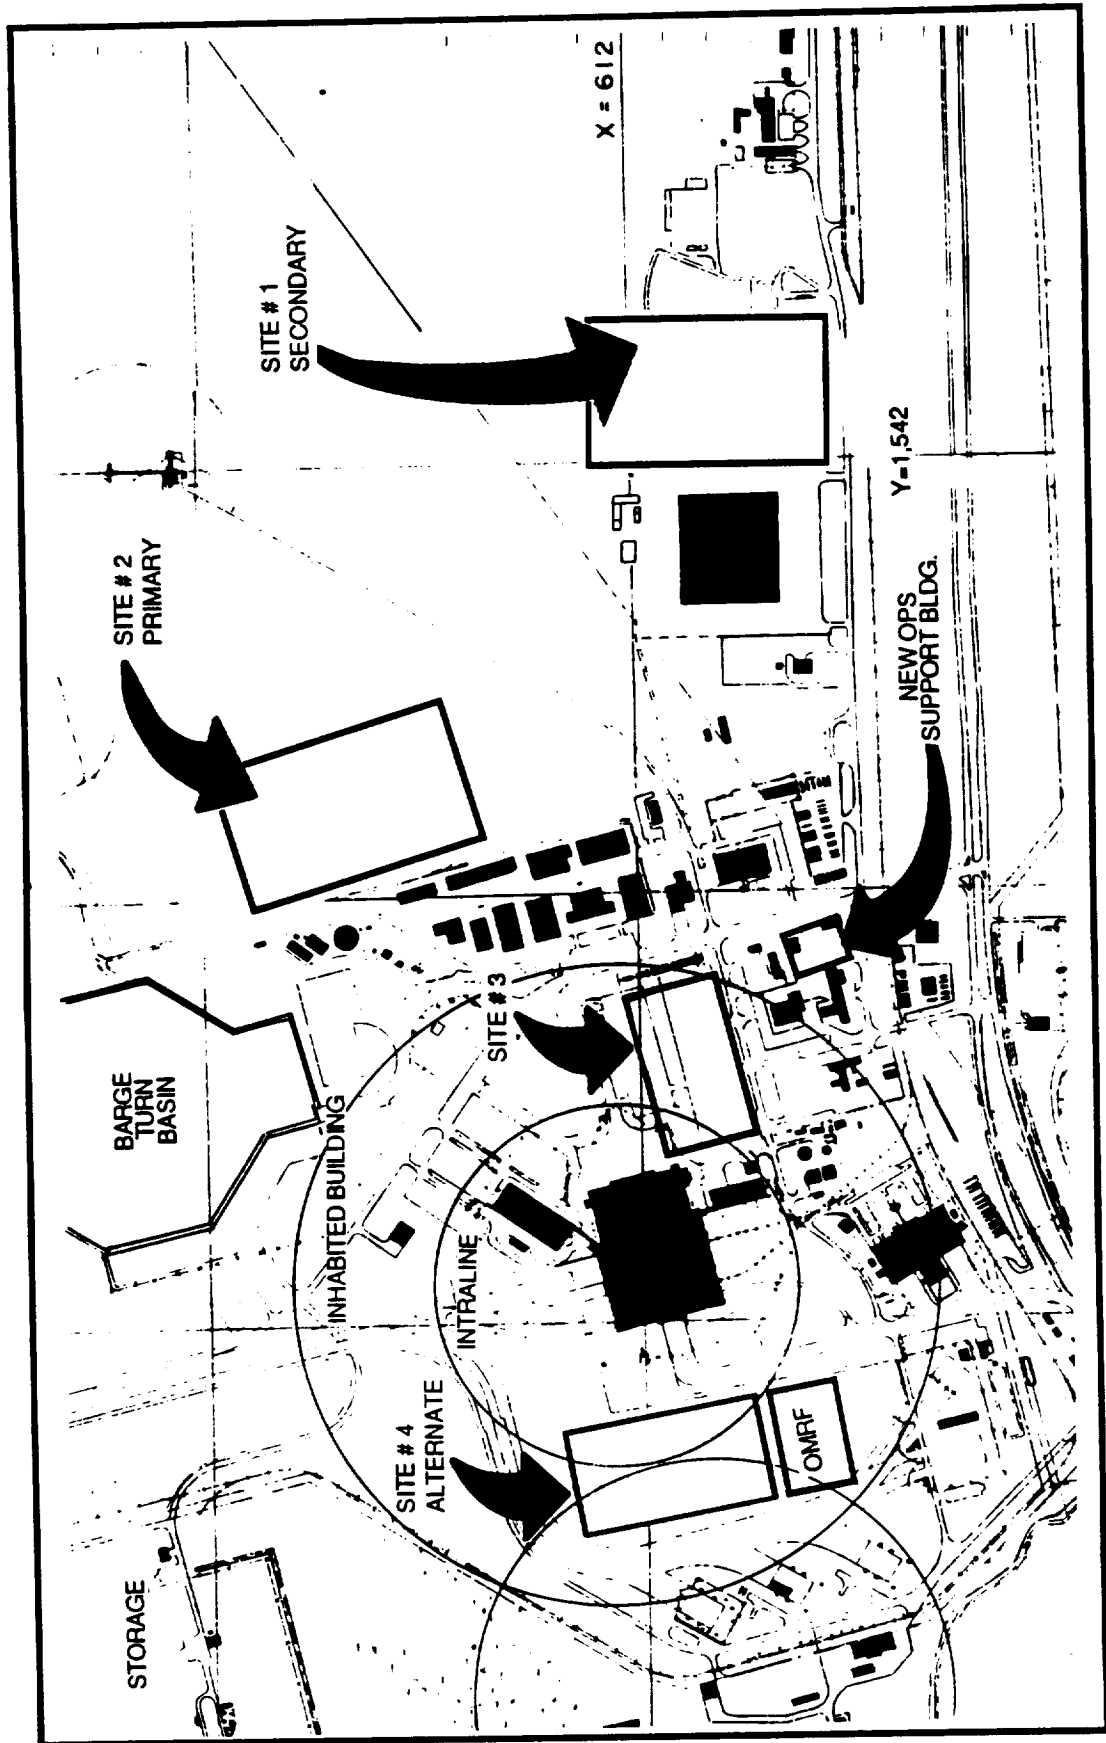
Possible Site of Proposed LRB Processing Facility.
